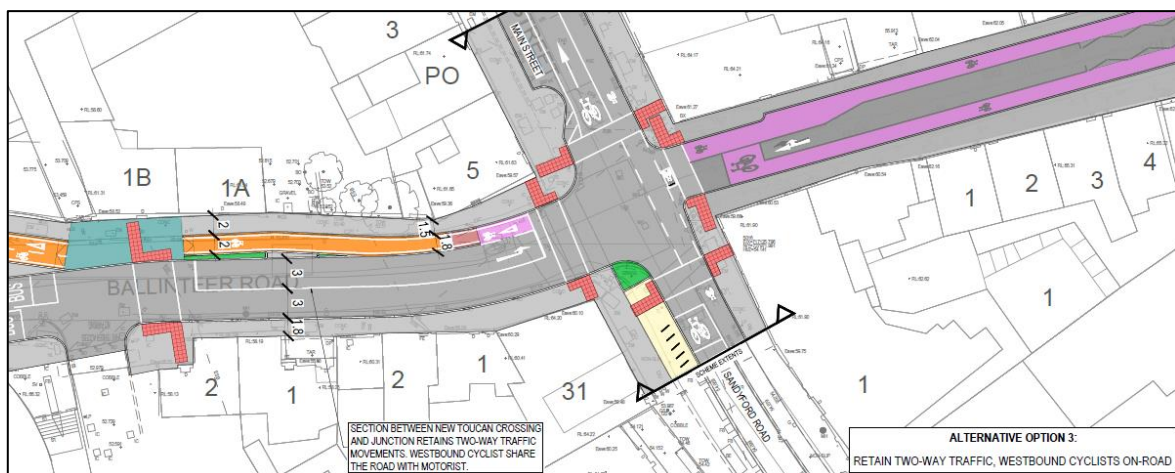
Sandyford Road / Kilmacud Road Upper / Ballinteer Road DS (Interim Option) 2028 Layout
